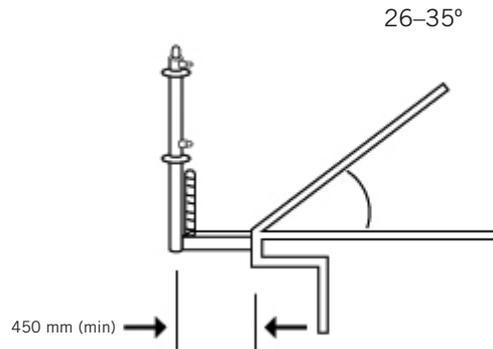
Roofs with pitch between 25 and 35 degrees require a two-plank platform guardrail system (end guardrail omitted for clarity)
